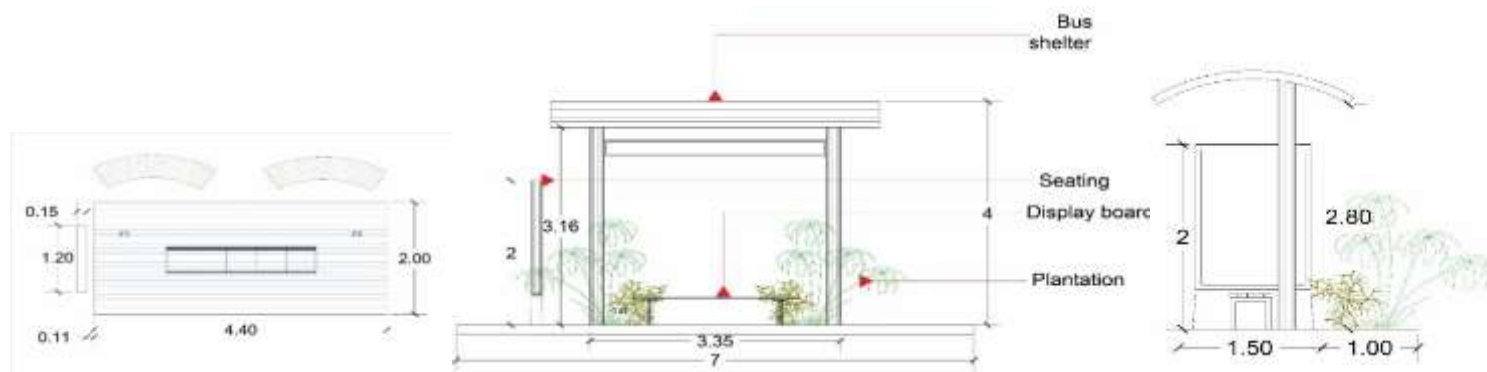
Proposed Plan, Section and Elevation for the prototype of bus shelter.
